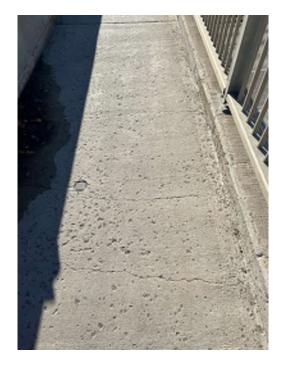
West sidewalk hairline to medium transverse cracks
